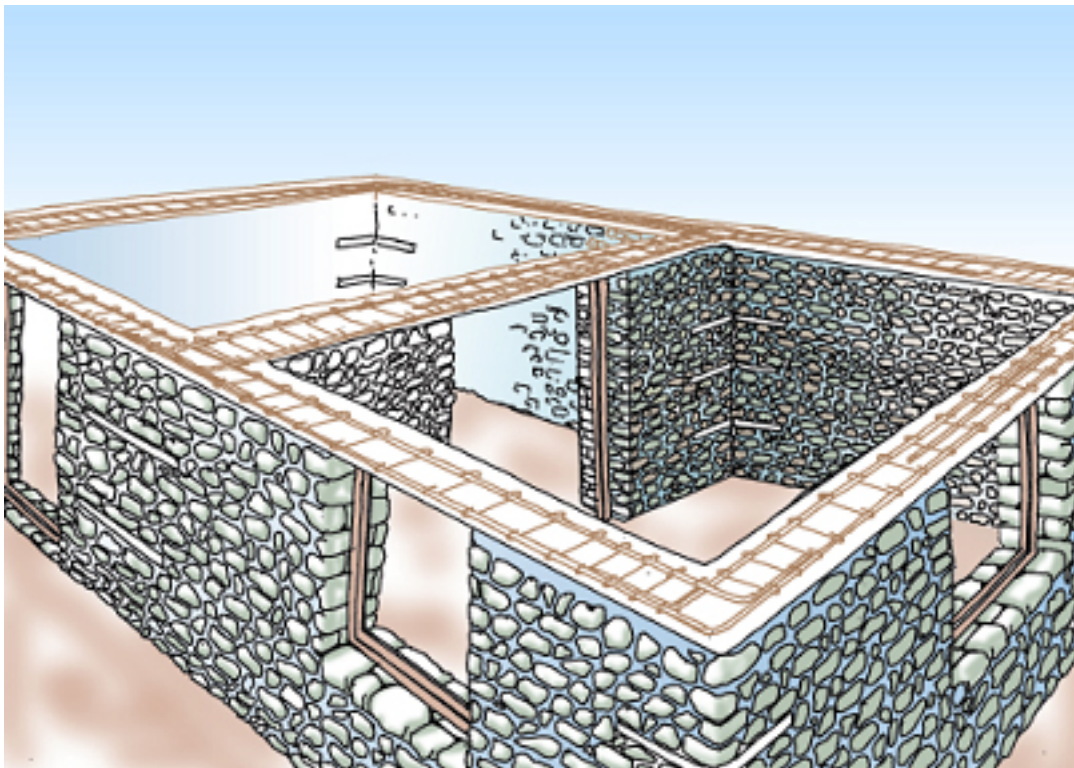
A: Seismic Strengthening Techniques-Stone Masonry Walls Strengthened with Wall Corner Stitches and Bands (bond beams)
